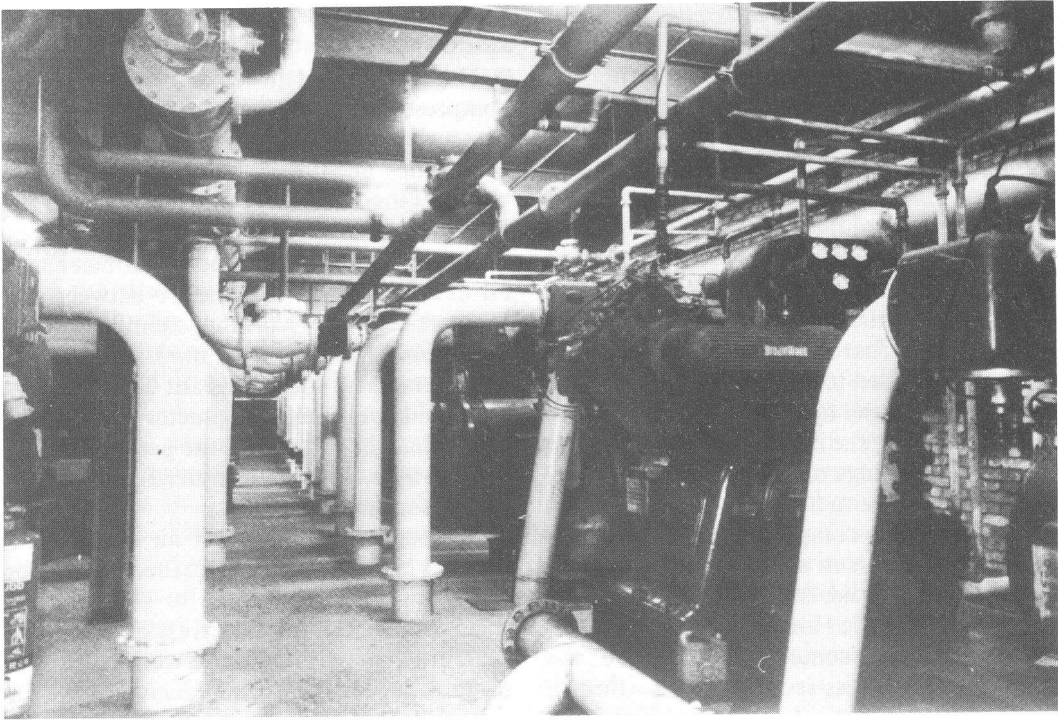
Typical compressor house. Mass Transit Railway, Hong Kong, G.K.L. joint venture
